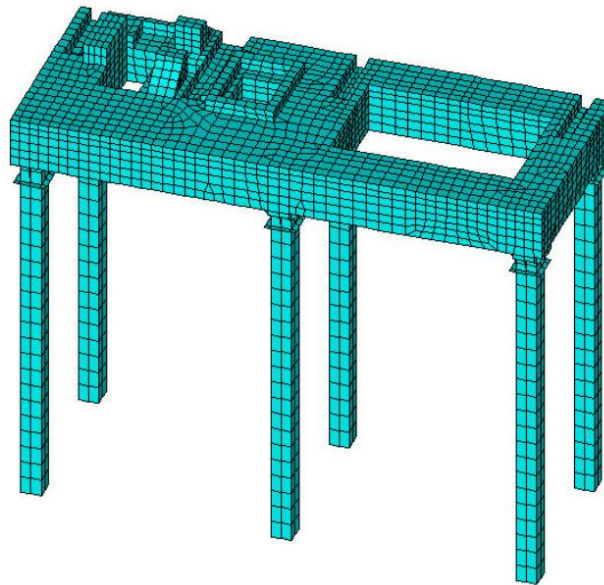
Finite Element Model of Turbo-Generator Structural Steel Foundation
